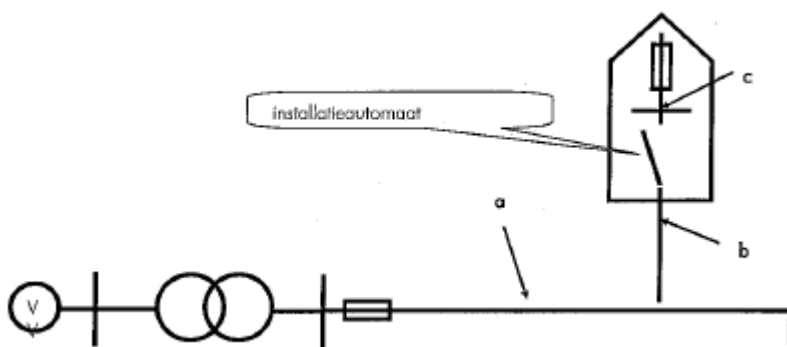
Places for grounding facilities fulfilling the TNA norms
